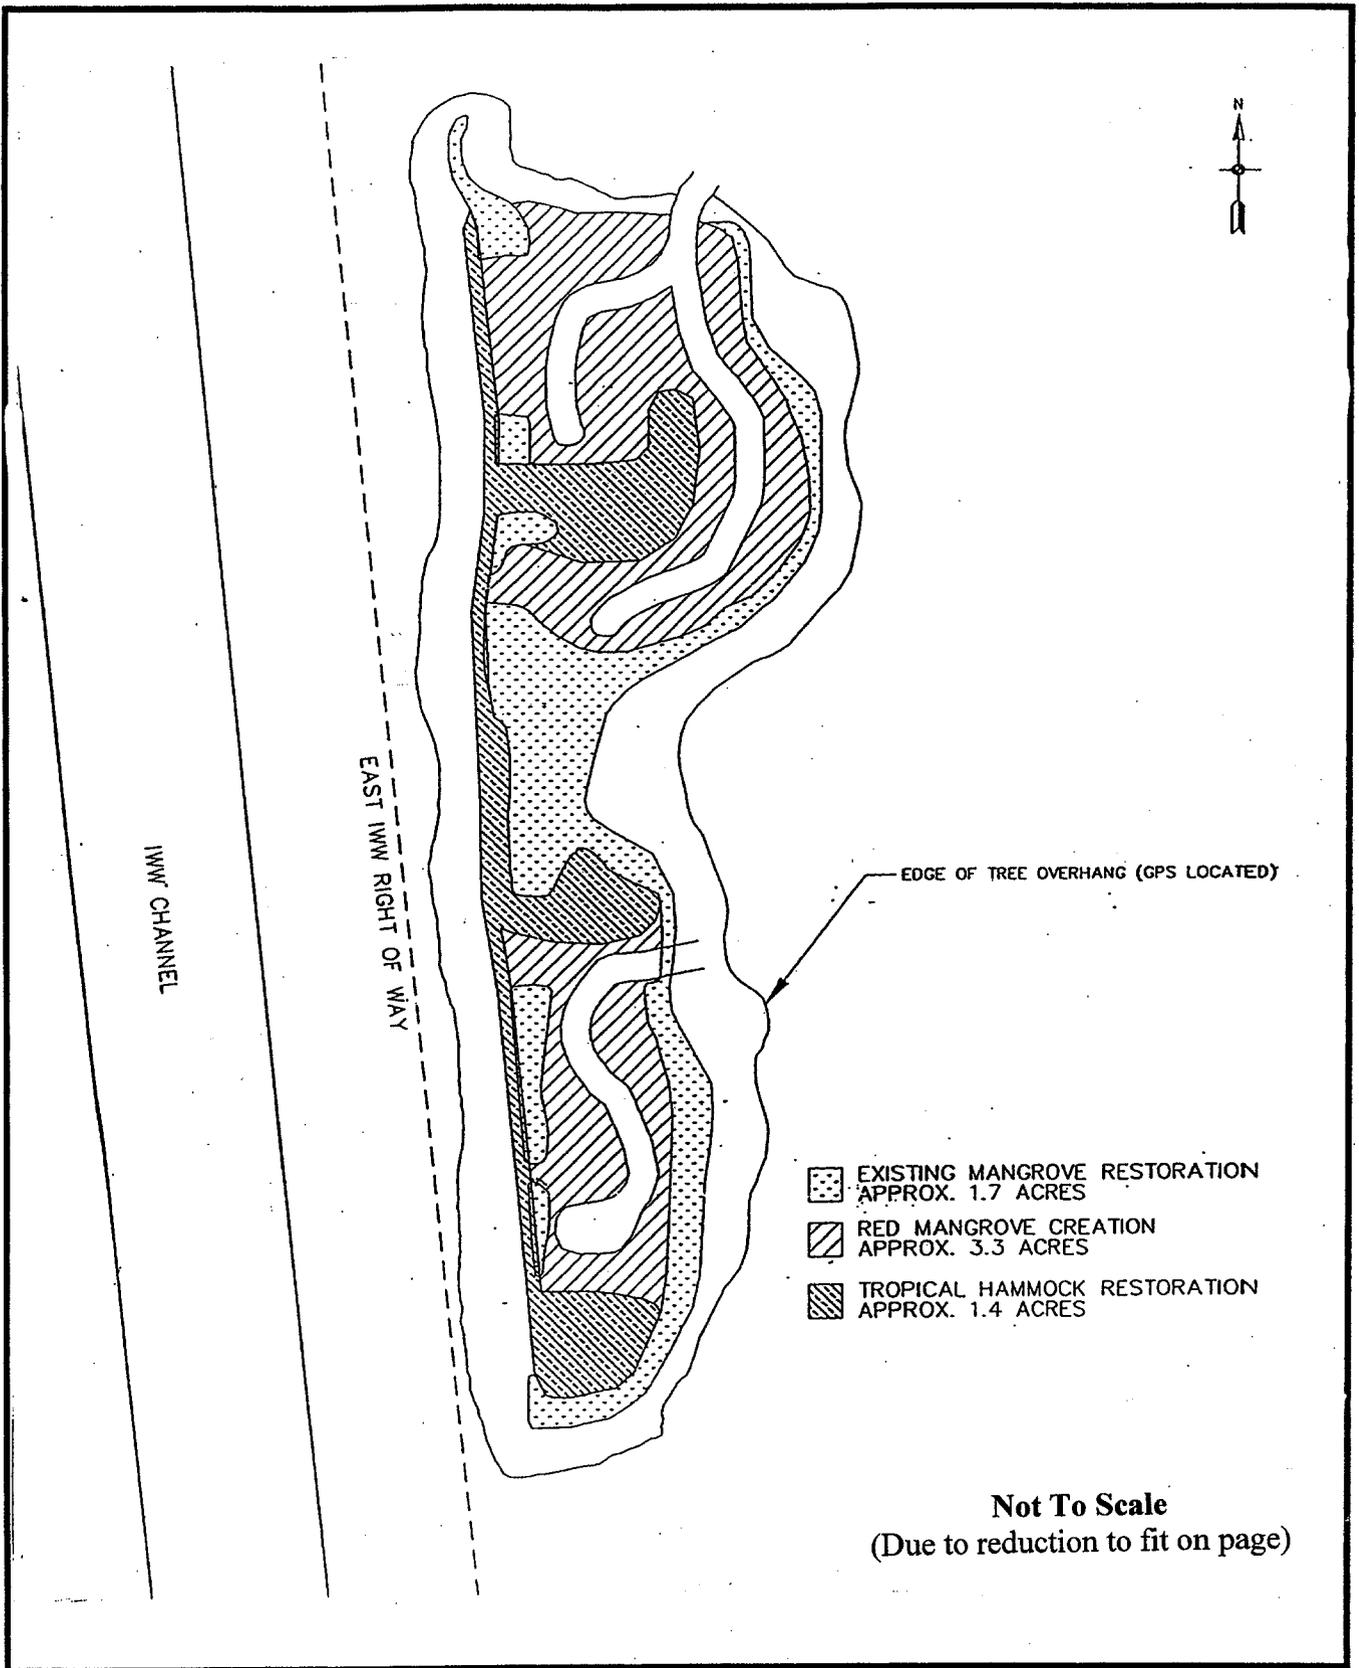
shows the conceptual schematic for the recommended plan. This plan will require constructing a tidal channel system with a total length of approximately a fourth of a mile that will include excavation; grading to wetland elevation, removal of approximately 17,000 cubic yards of material, and placement of approximately 500 tons of 1 to 3 foot diameter boulder rip rap to stabilize the tidal channel inlets.
